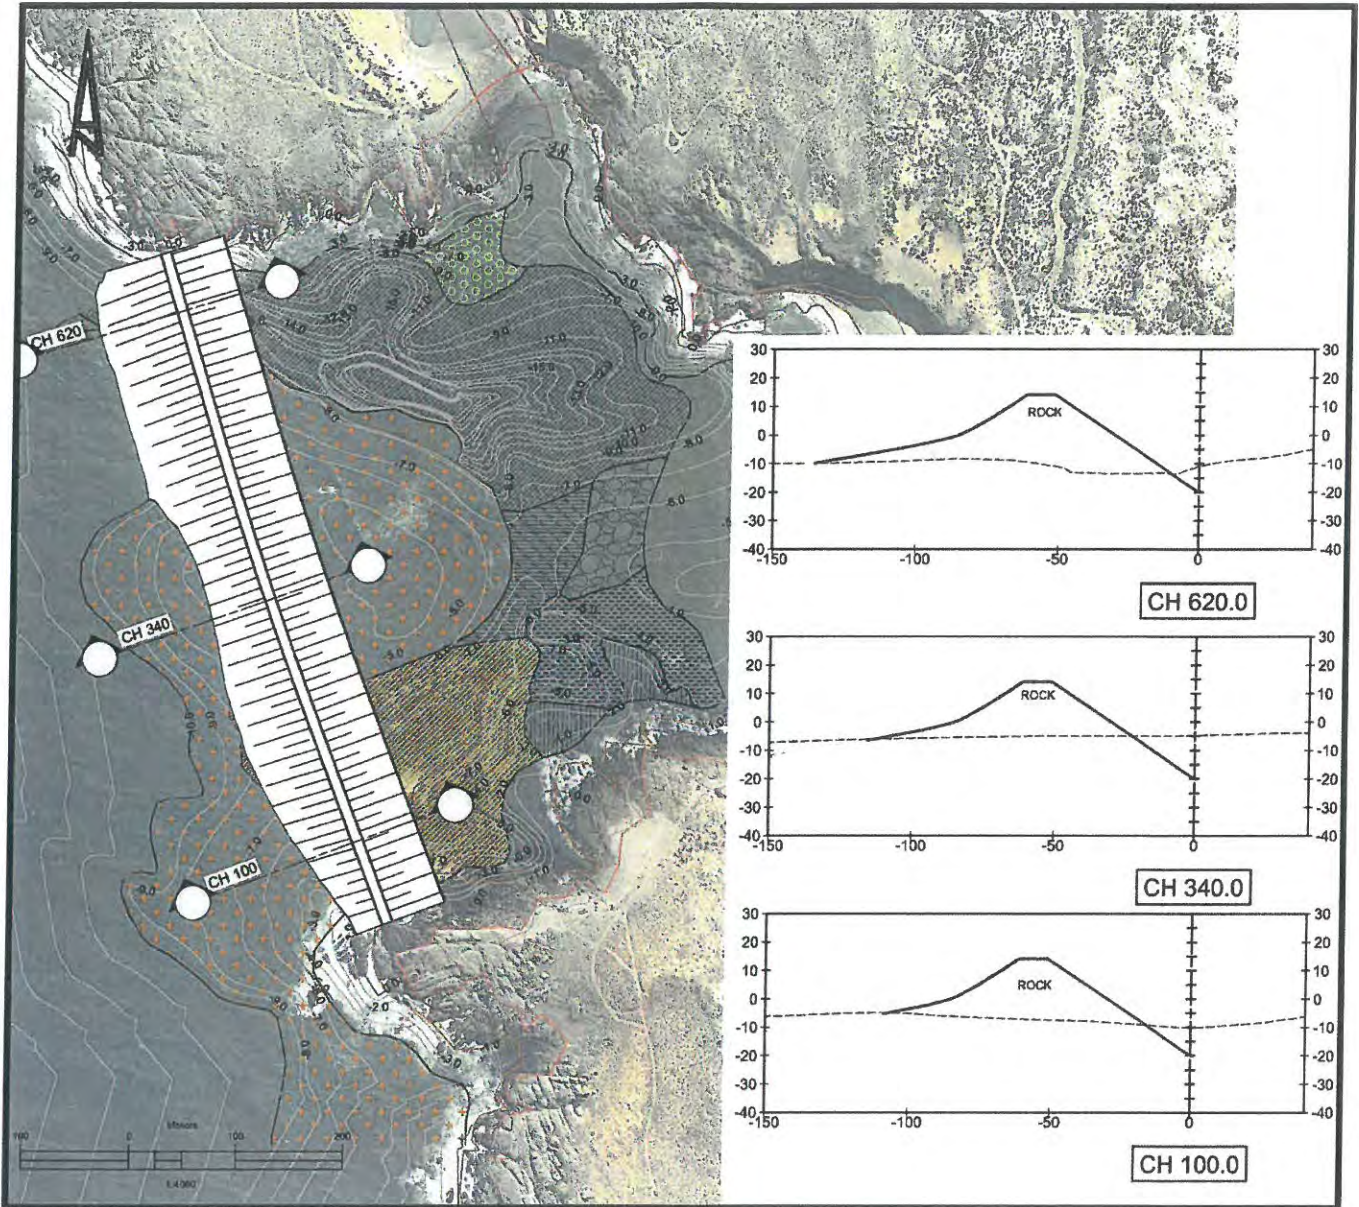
Layout of generic rock berm designs to be applied on the rocky shoreline
